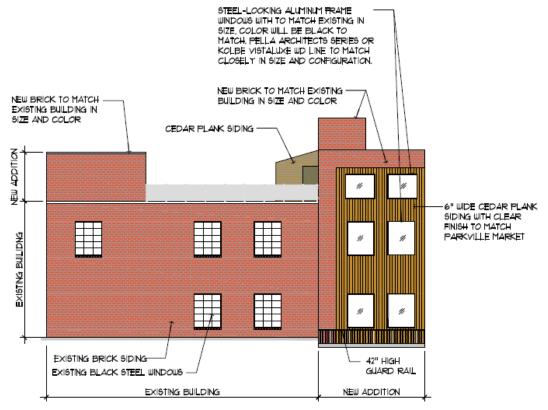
North façade of the existing building w/ proposed addition – Lifecare Design 2022
